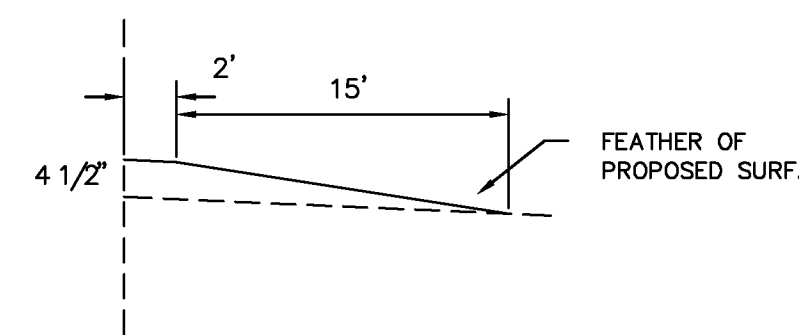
DETAIL OF INTERSECTION 25+96 LT AND RT
